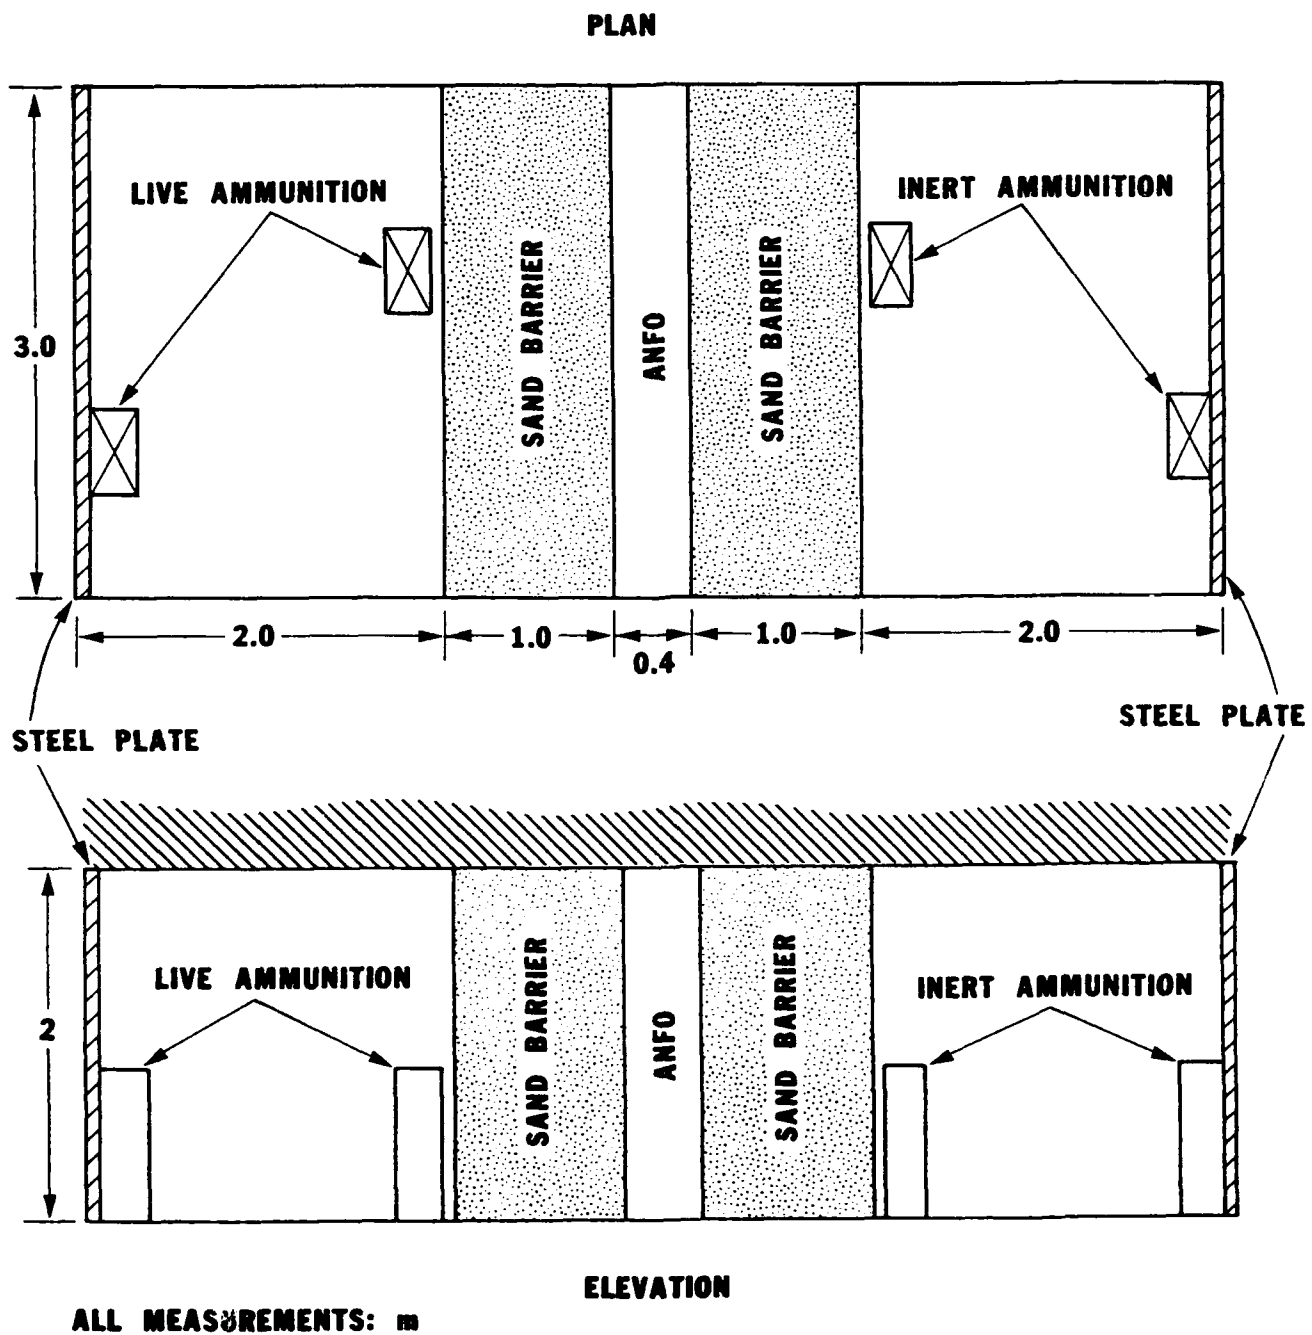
Side Elevation and Plan Views of the Proposed Experimental Arrangement.
